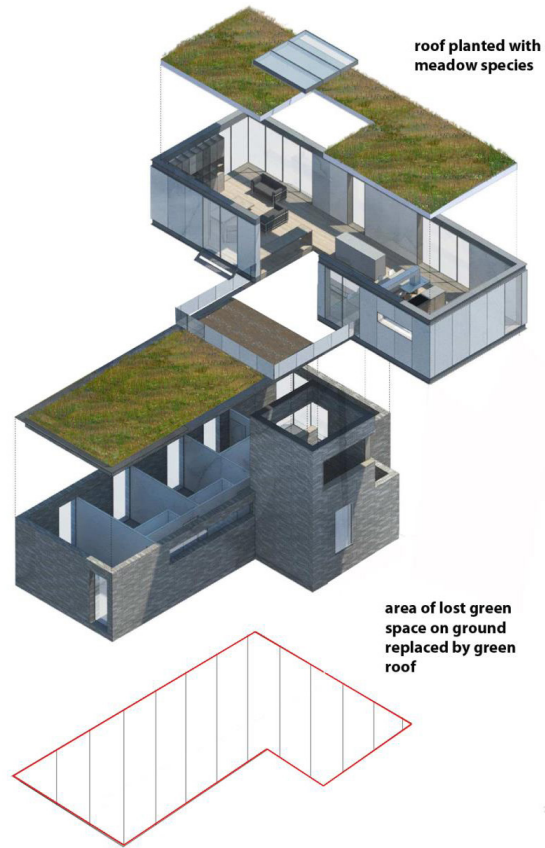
Exploded drawing showing roofs being planted to replace green space lost on the ground through the building the houses
